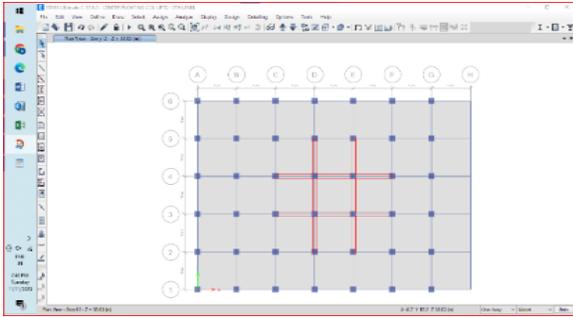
presents the plan view of the building model incorporating flag walls positioned at the central region of the structure
